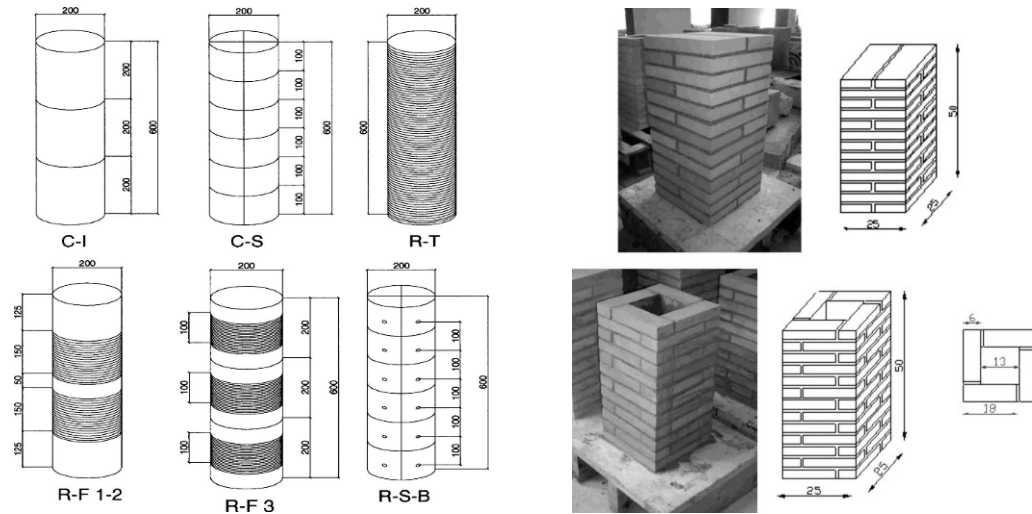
Testing wrapped masonry columns under increasing axial load (Masia and Shrive, 2003)
